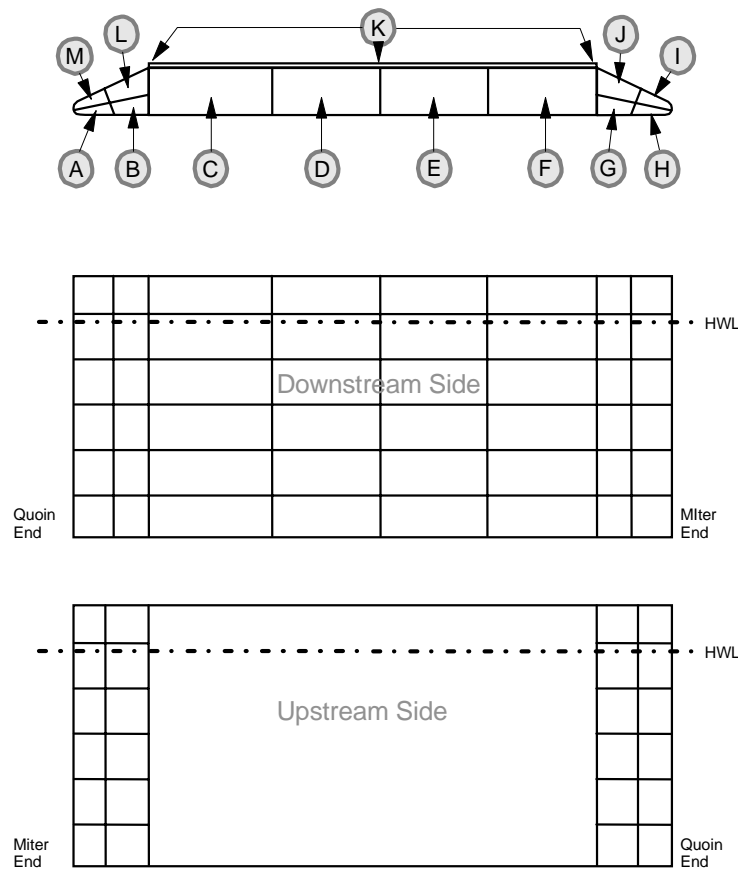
LOCK GATE VERTICAL, DOWNSTREAM AND UPSTREAM STRUCTURAL LAYOUT
